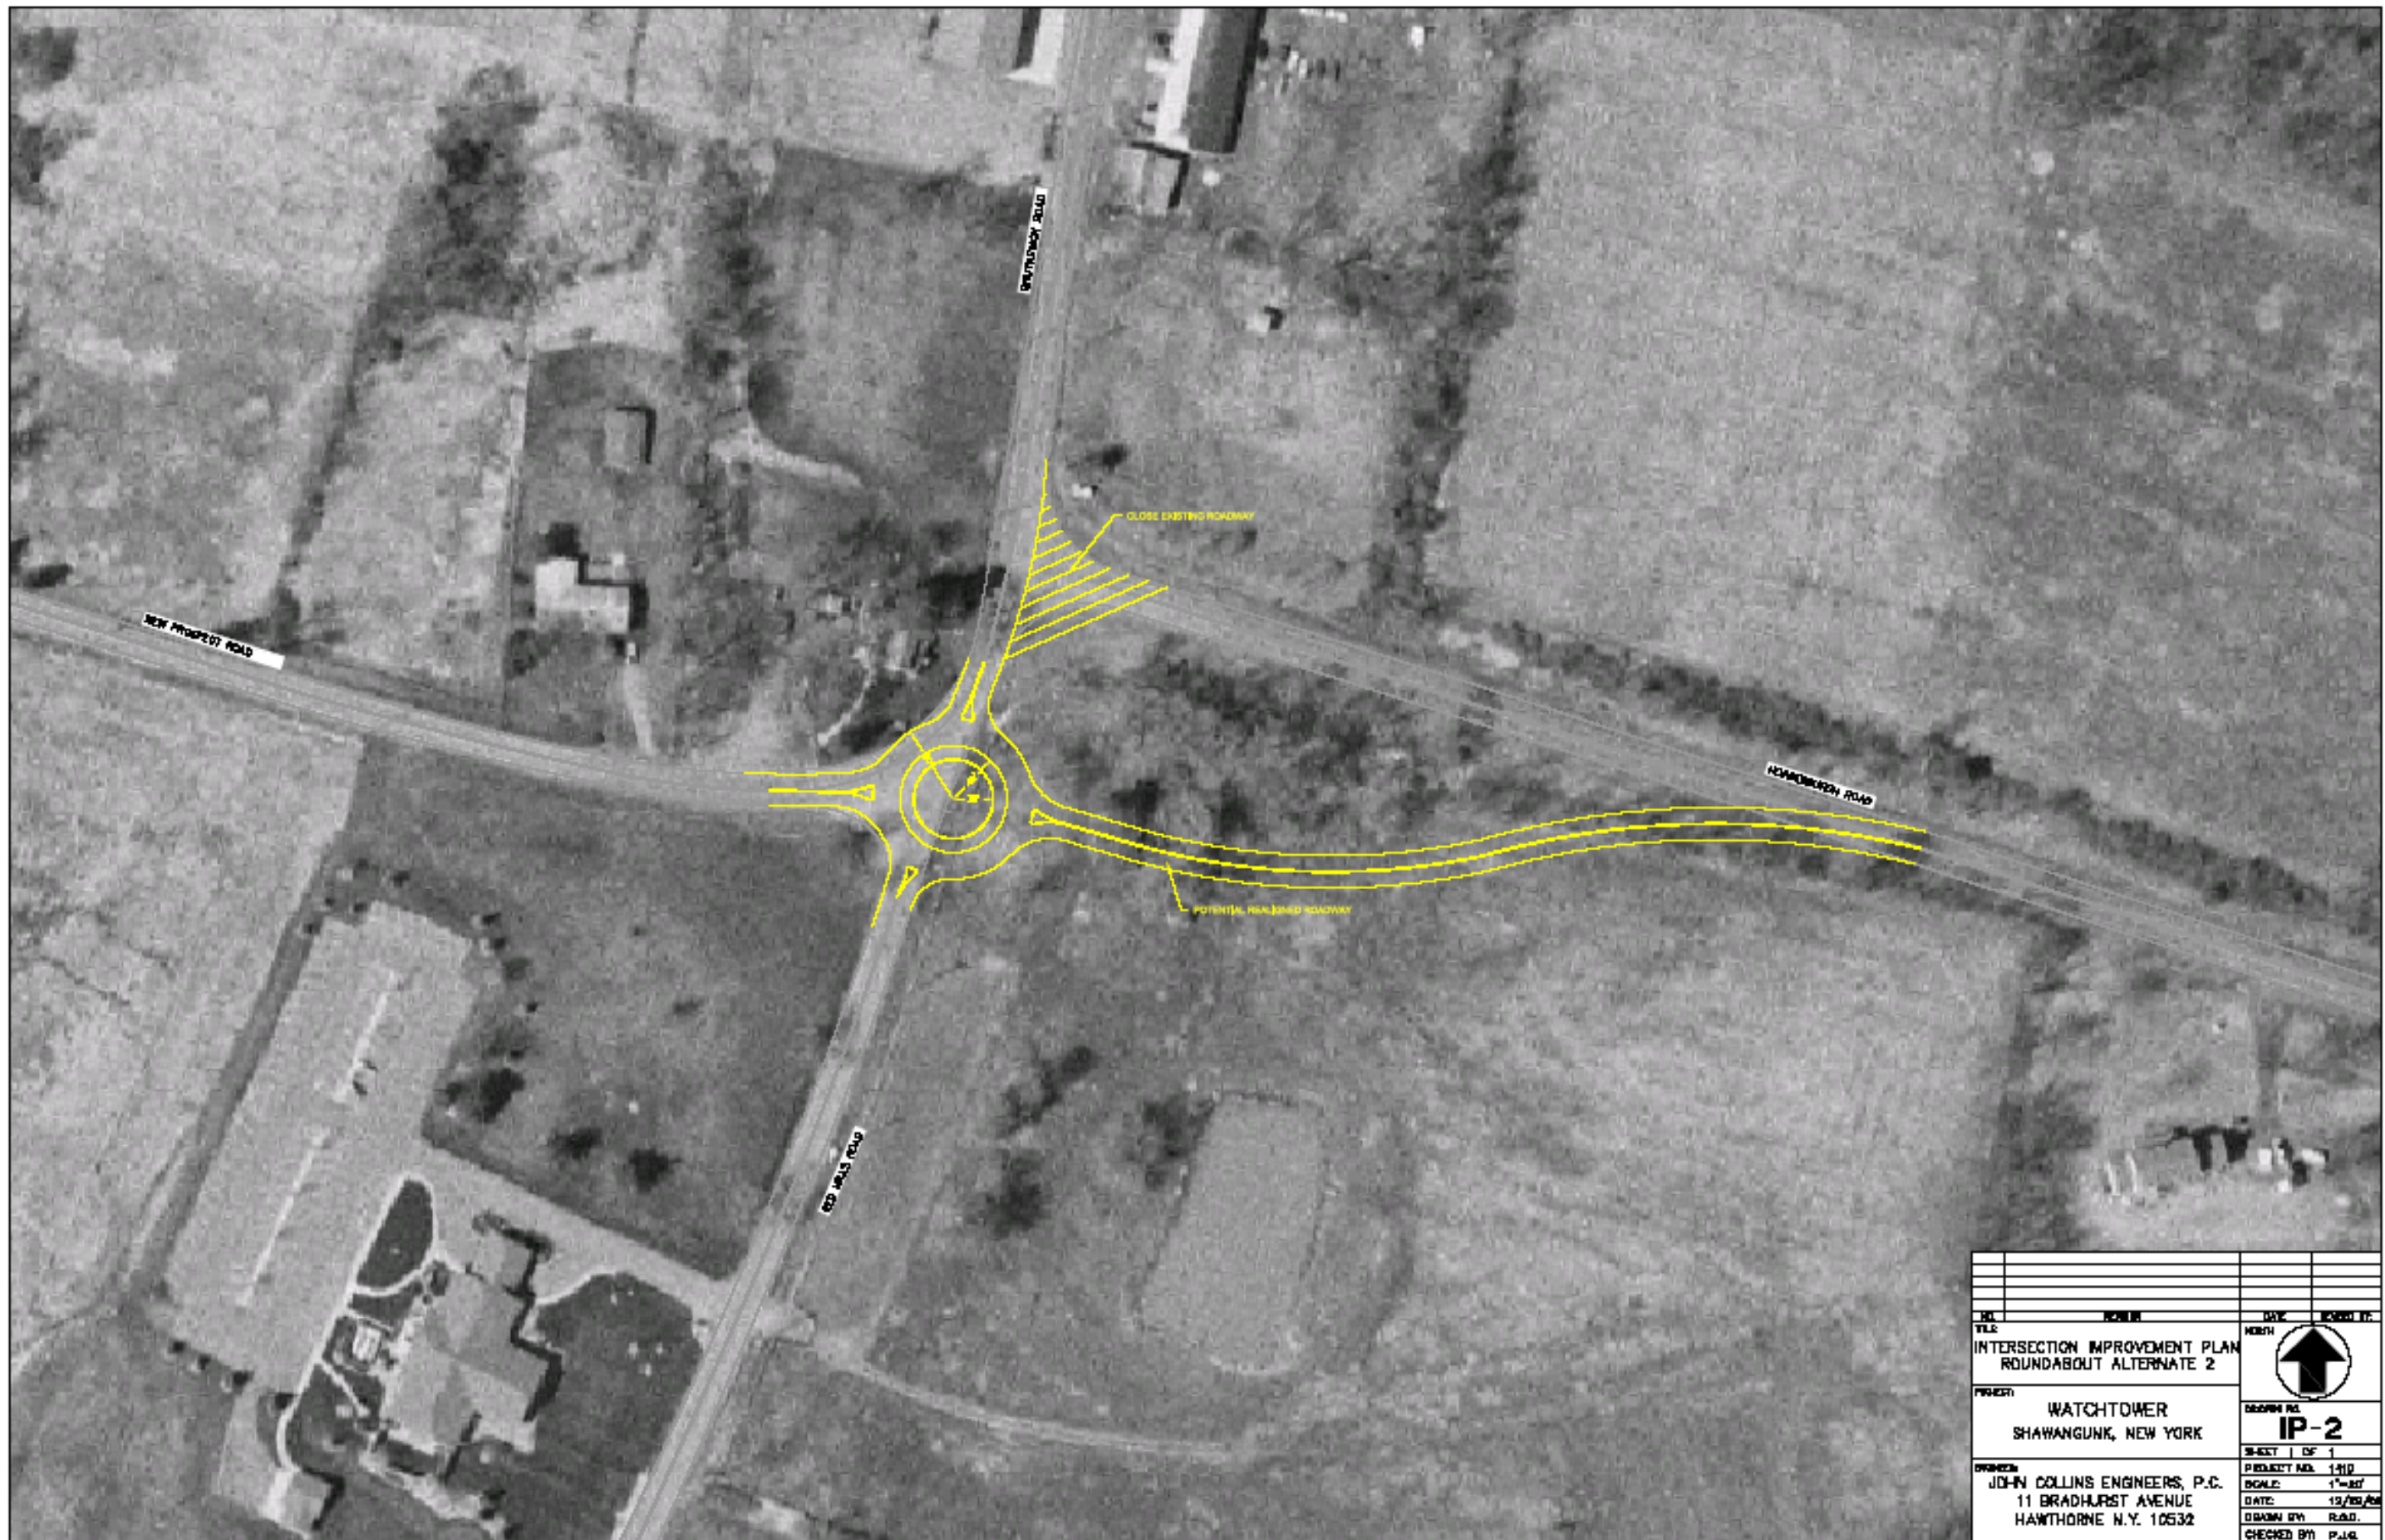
Intersection Improvement Plan Roundabout Alternate 2 (IP-2)
